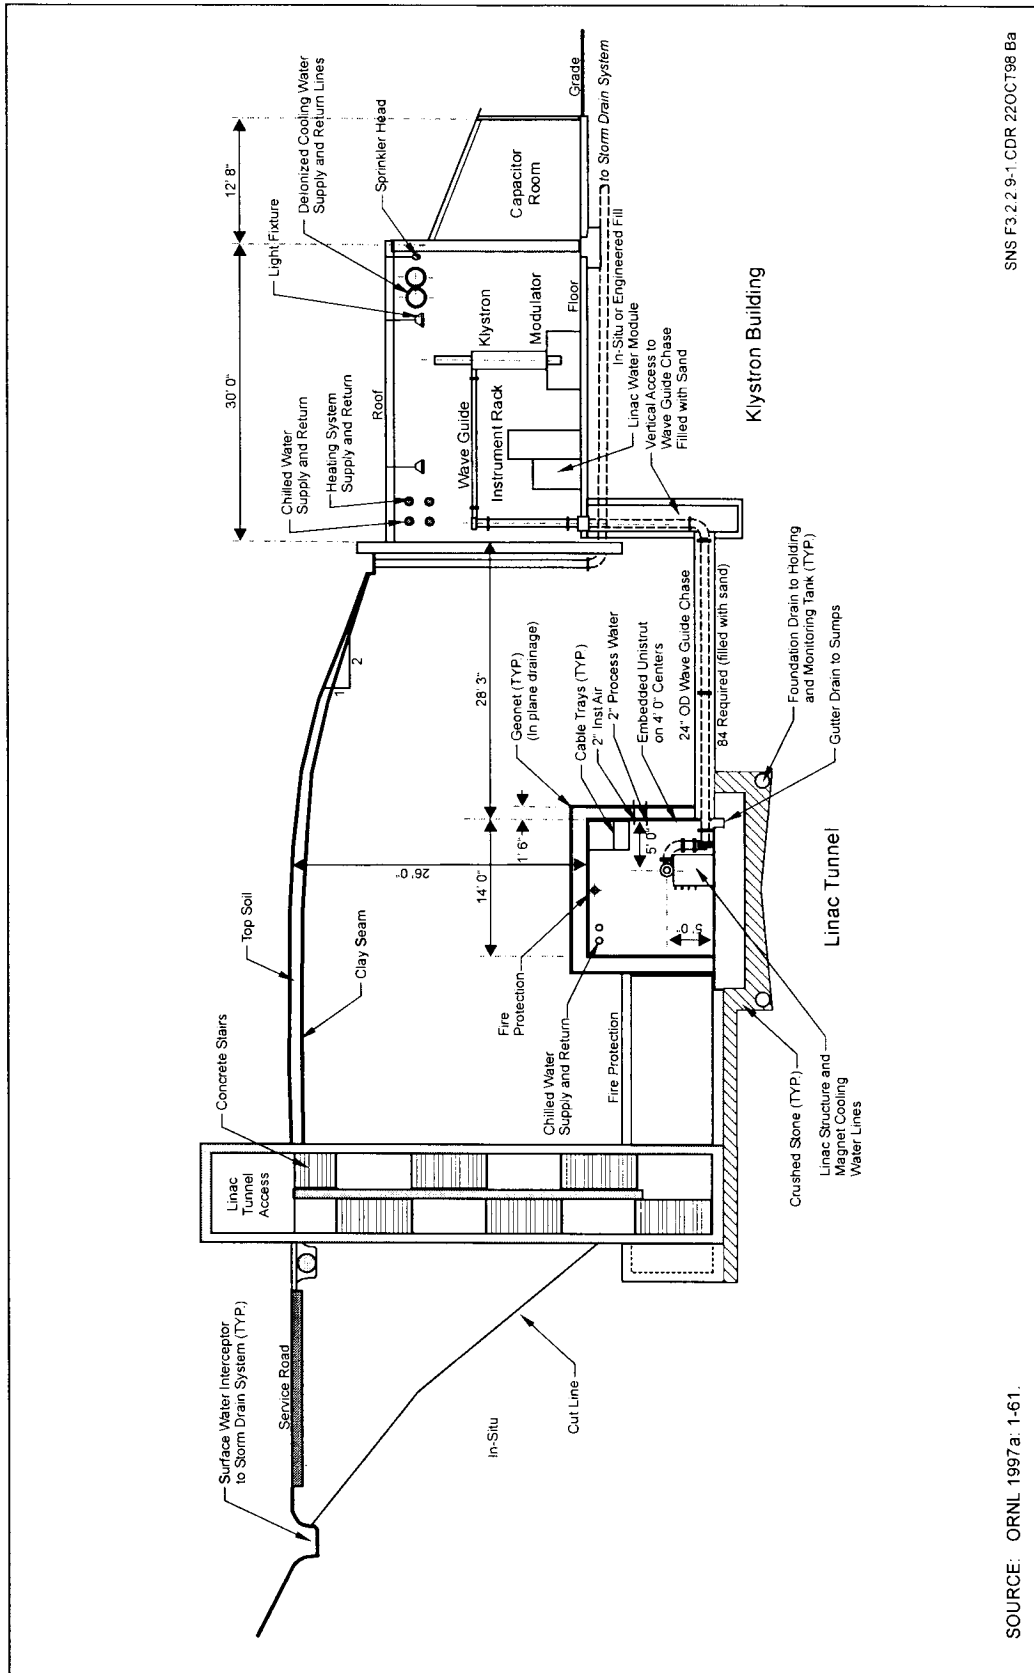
Detail of linac tunnel and shielding berm.
